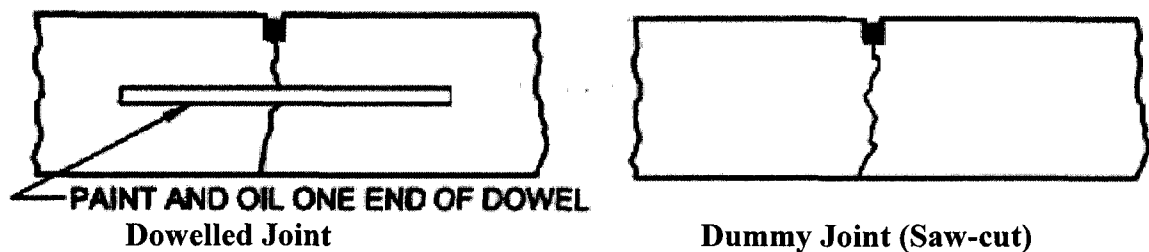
Typical details of a dowelled and saw-cut contraction joint
